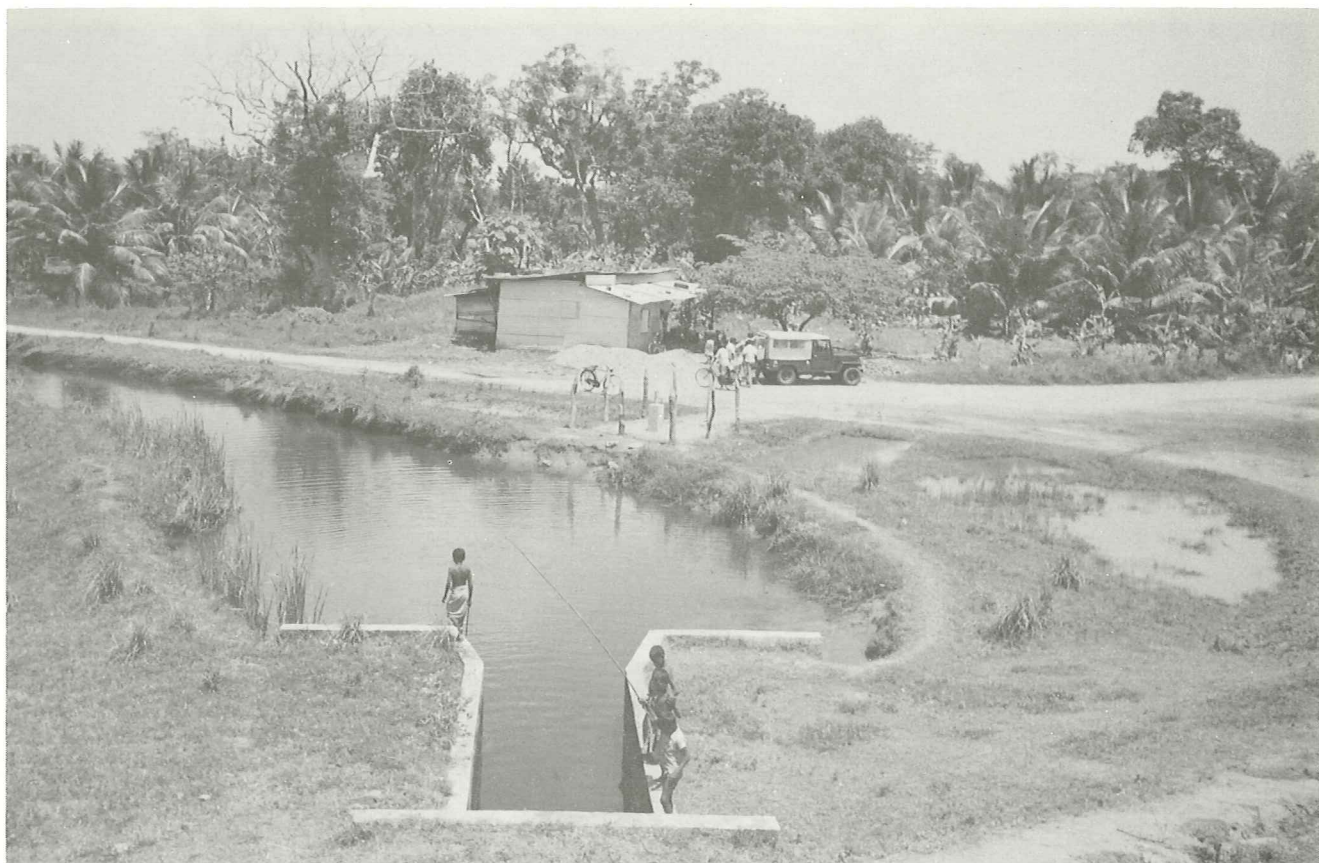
Ambagaswewa Daily Raingauge, below LB sluice
